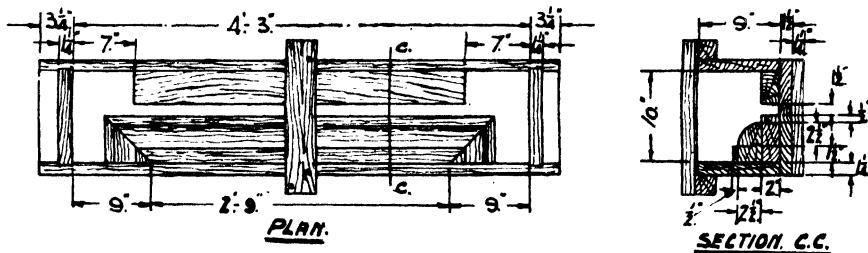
MOULD FOR HEAD D OF CONCRETE DOORWAY
